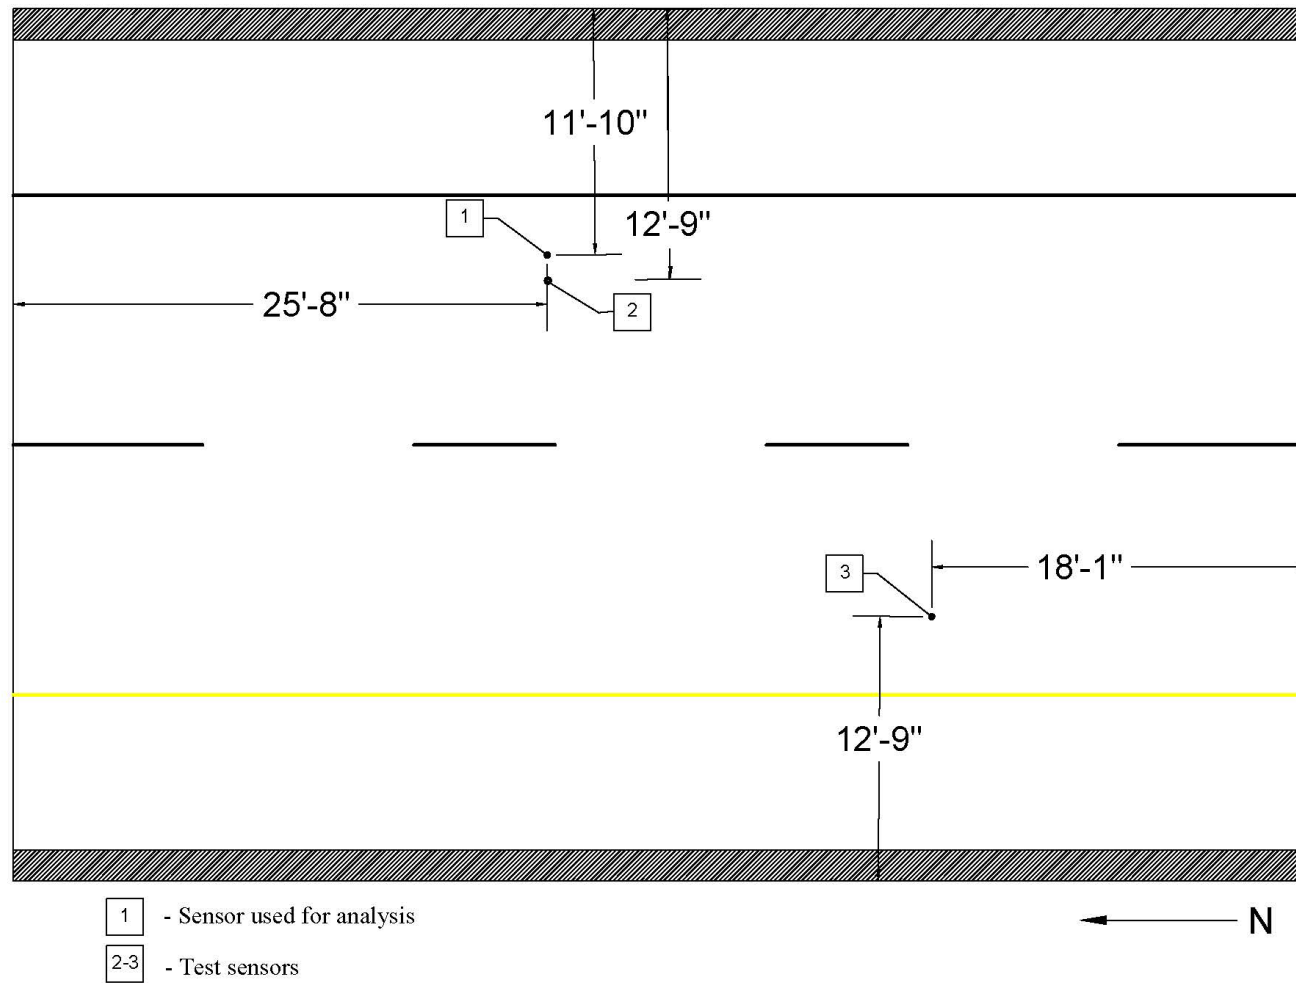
Location of all sensors installed in Upper Ridge Road SB deck.
